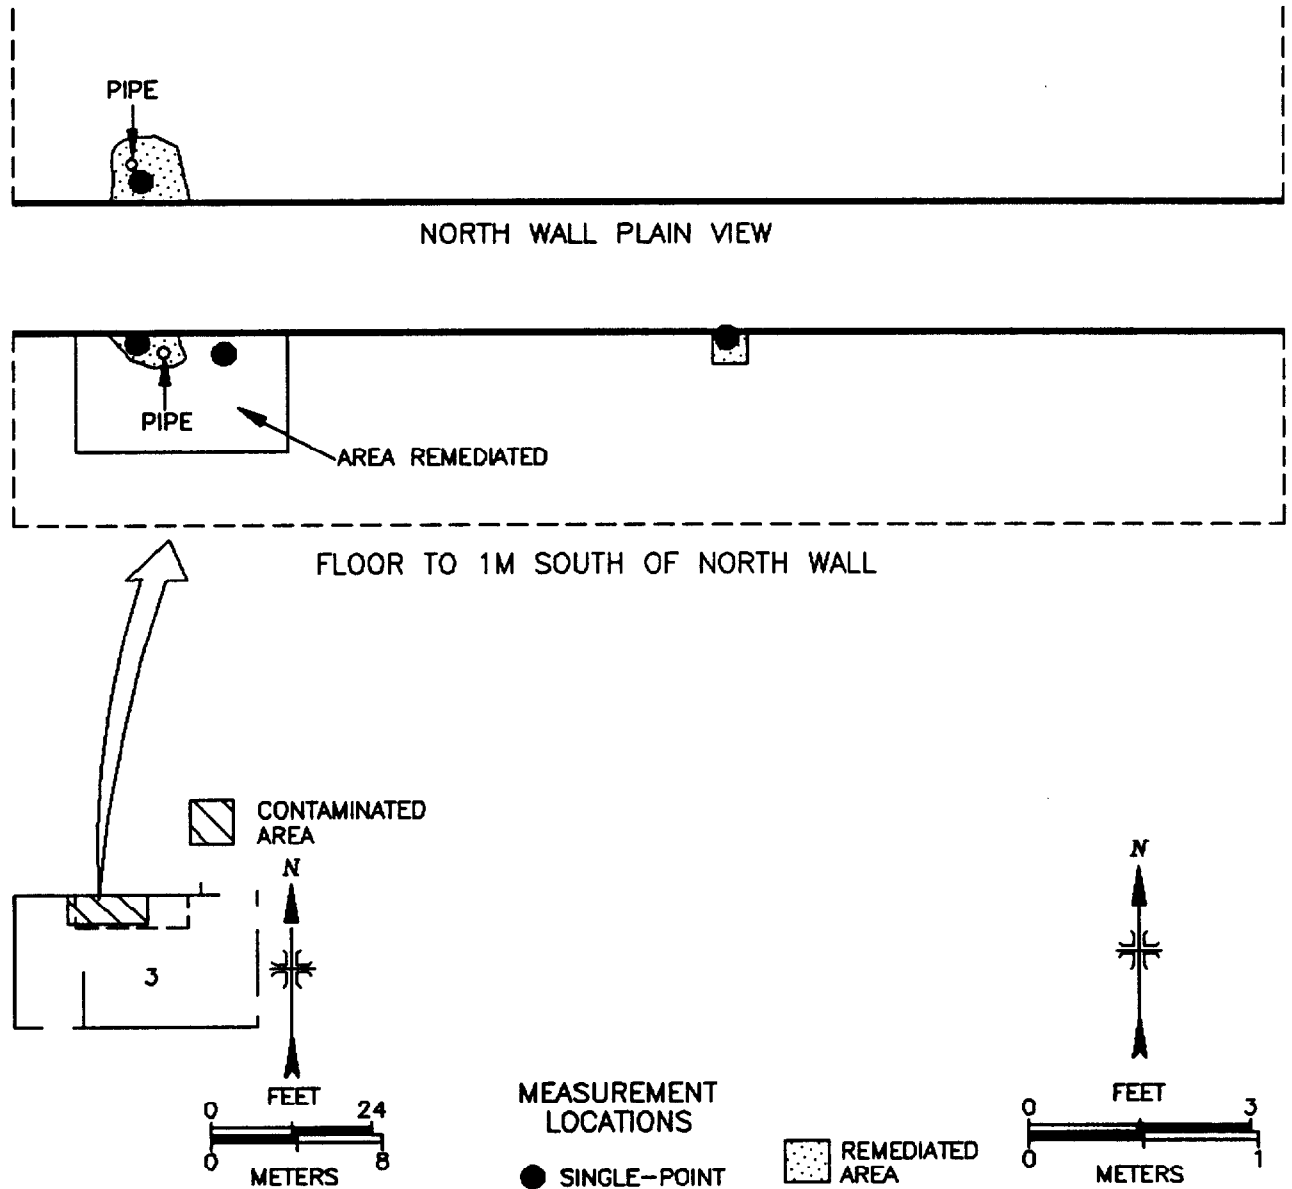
Building 28, Room 3 Floor and North Wall – Remediated Areas and Measurement Locations
